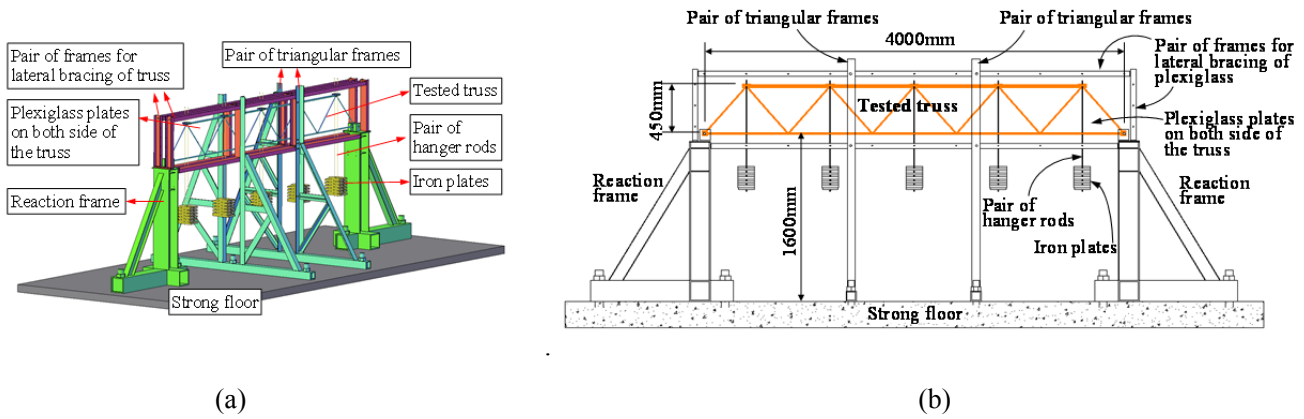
Test setup. (a) aerial view; (b) elevation view
